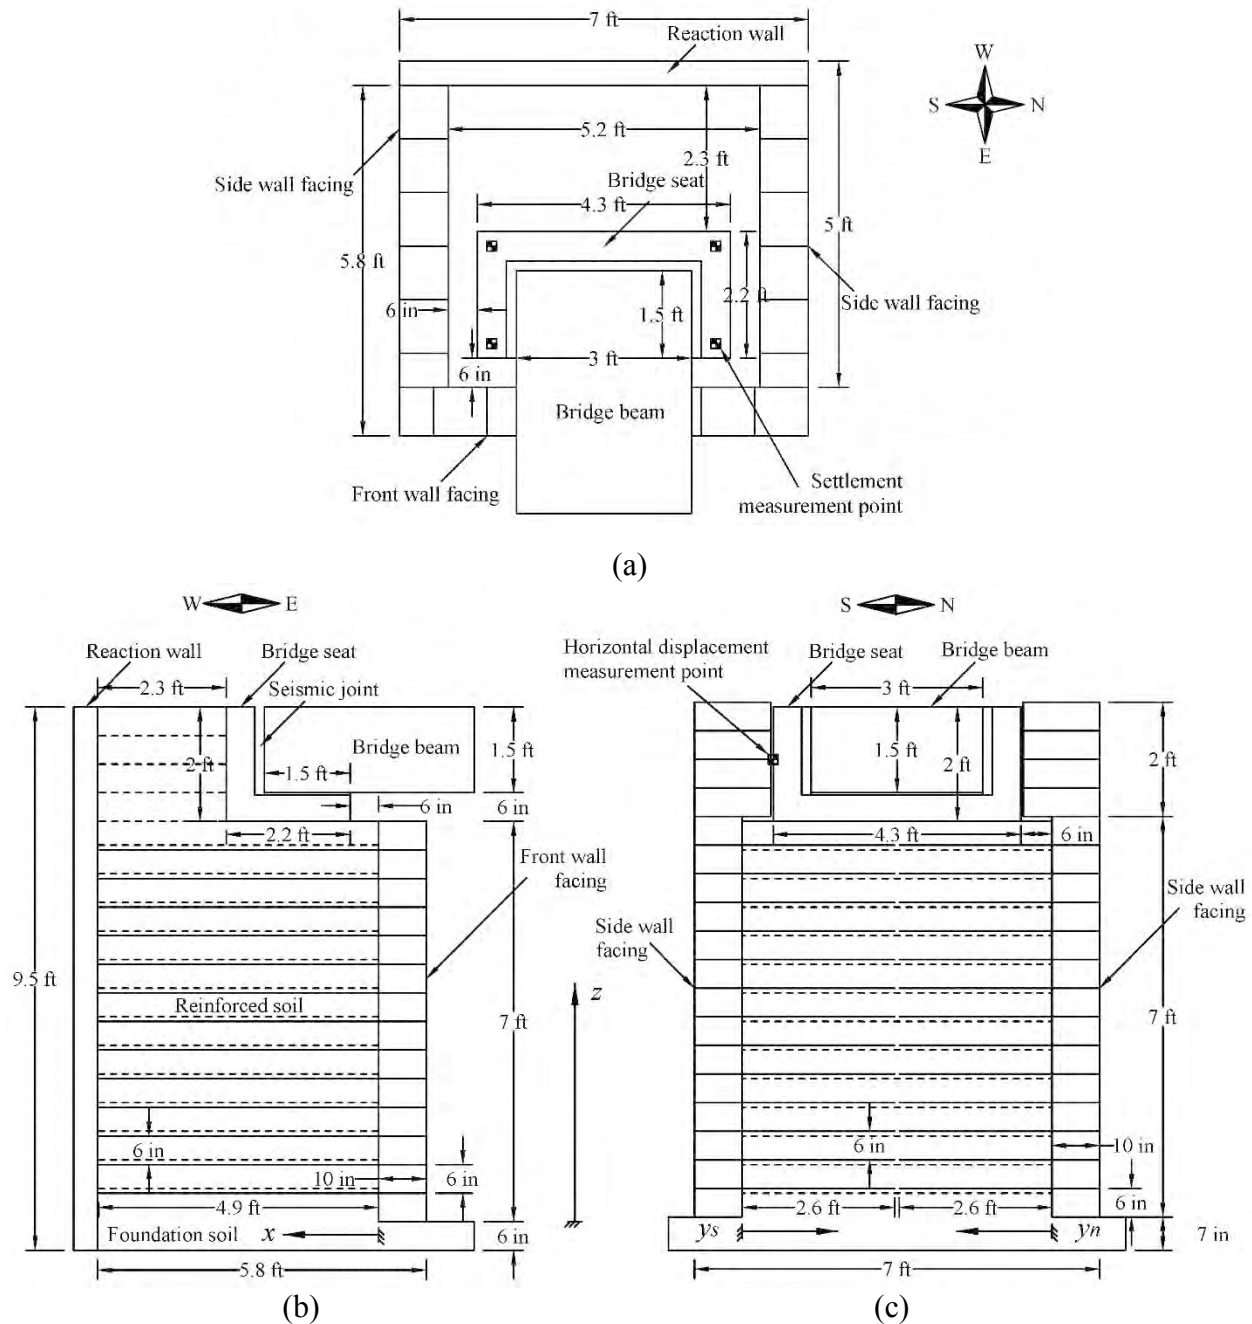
MSE bridge abutment model for the transverse test: (a) top view; (b) longitudinal cross-sectional view; (c) transverse cross-sectional view. Note: dashed lines indicate reinforcement layers perpendicular to diagram.
